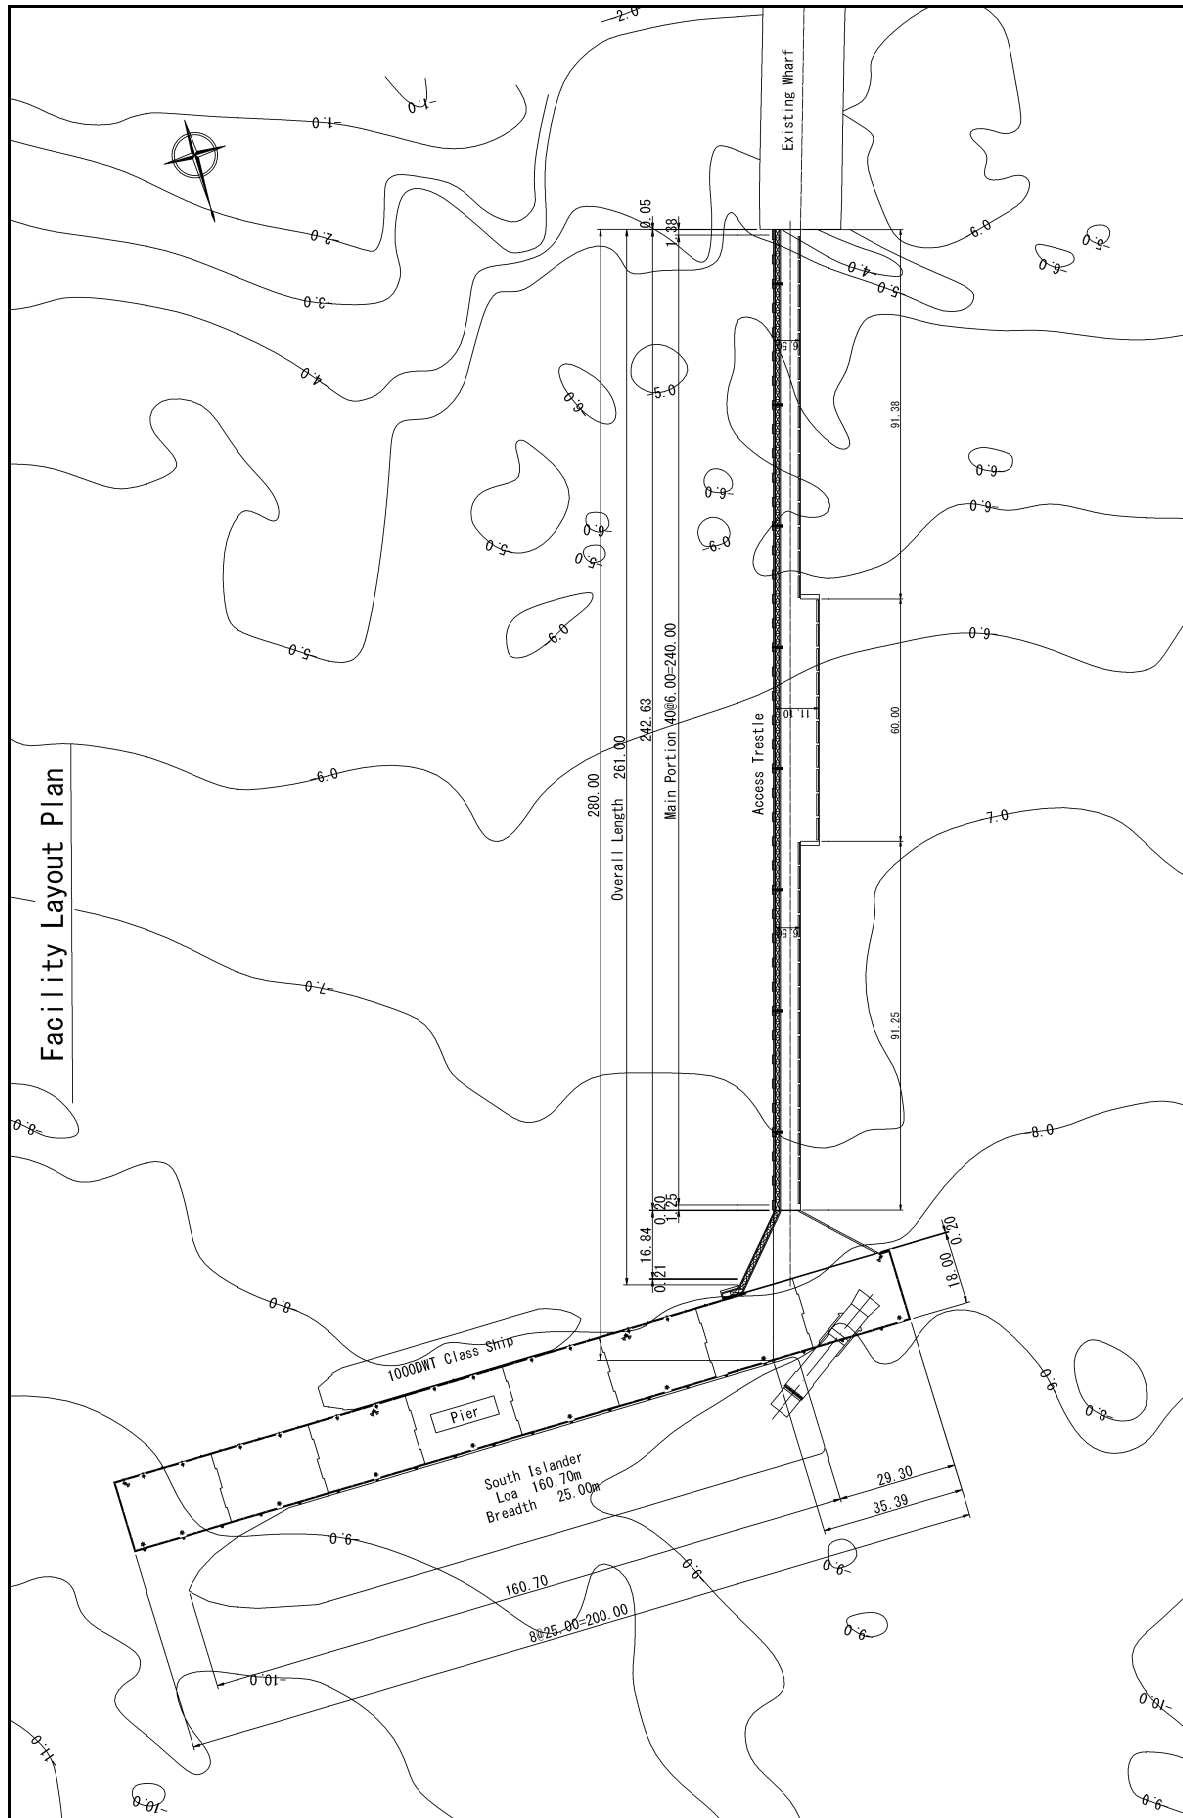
Layout Plan of Pier and Access Trestle
